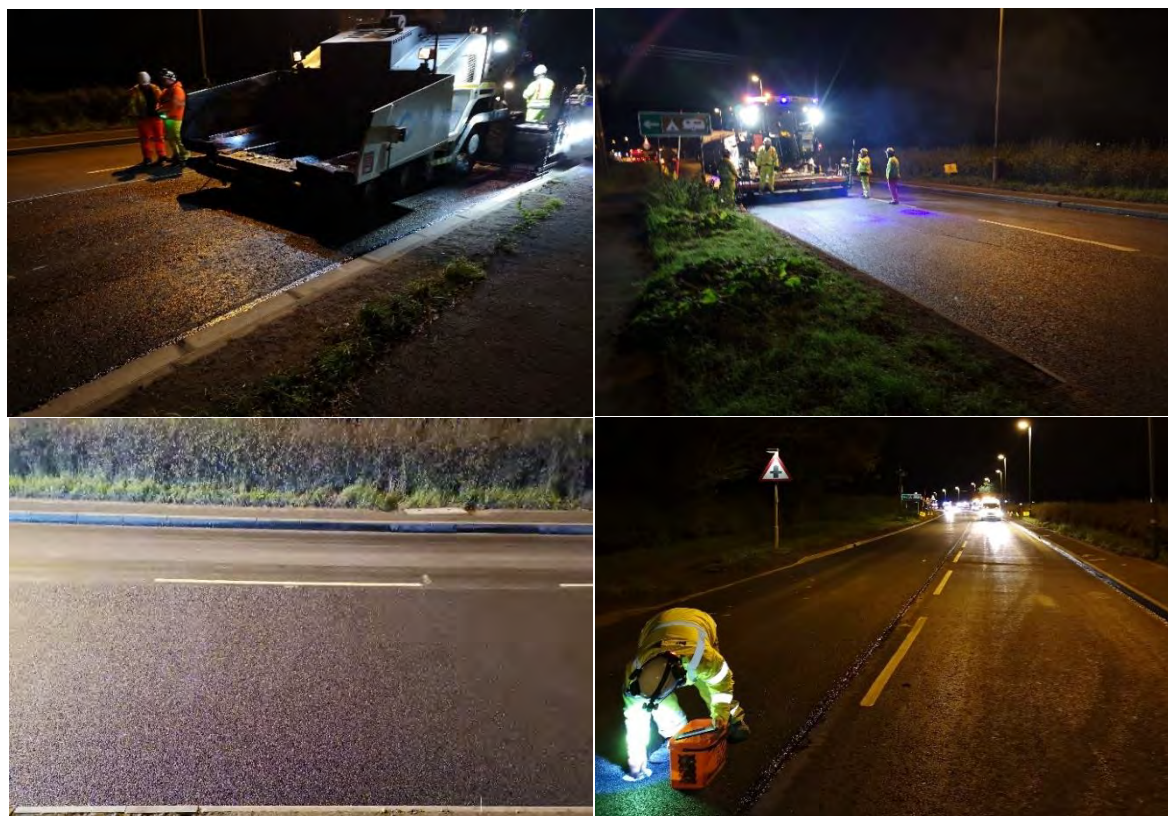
Installation of PASS on A458 Welshpool Road Shrewsbury/Ford Village (Westbound)
